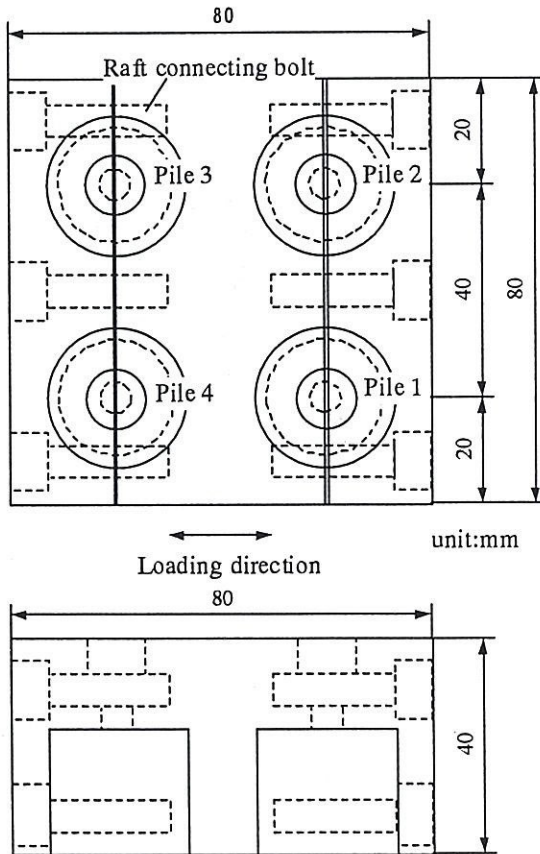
Details of model raft with hinged pile hinged head connection
